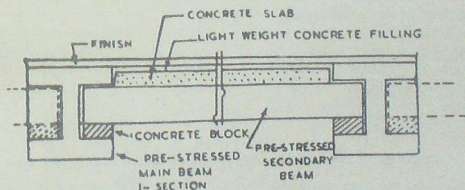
Prestressed floor construction using secondary beams and main beams.
